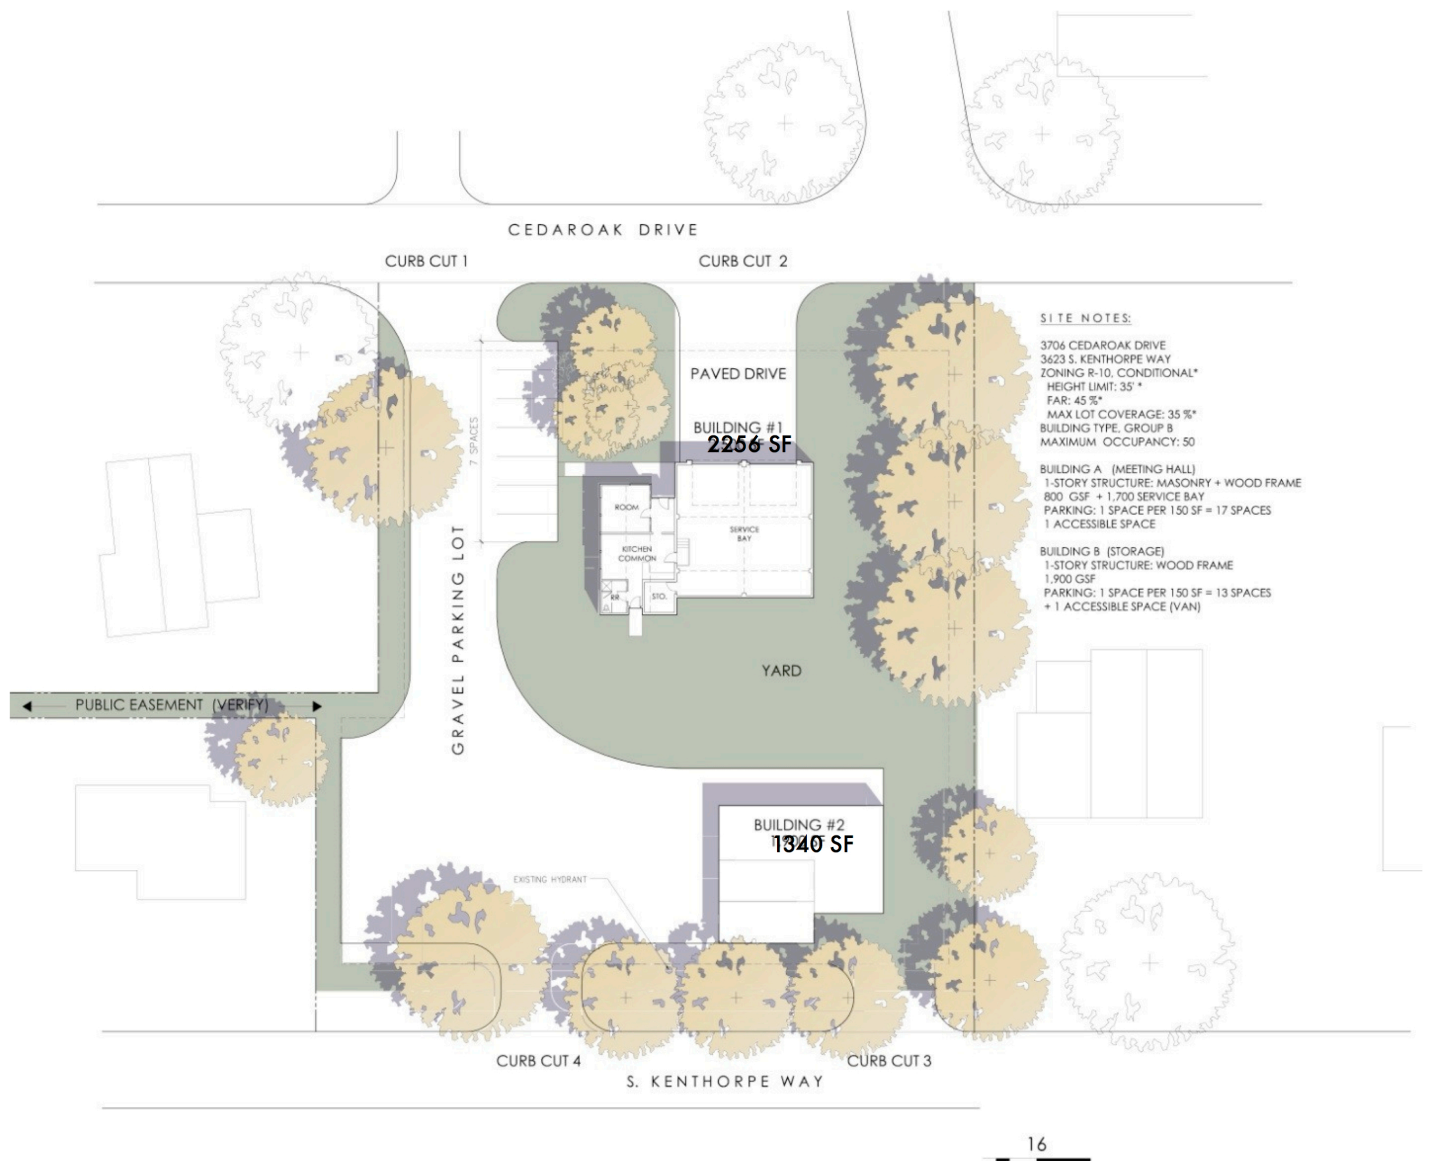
Site Plan of the existing facility Dimensions corrected 2013
